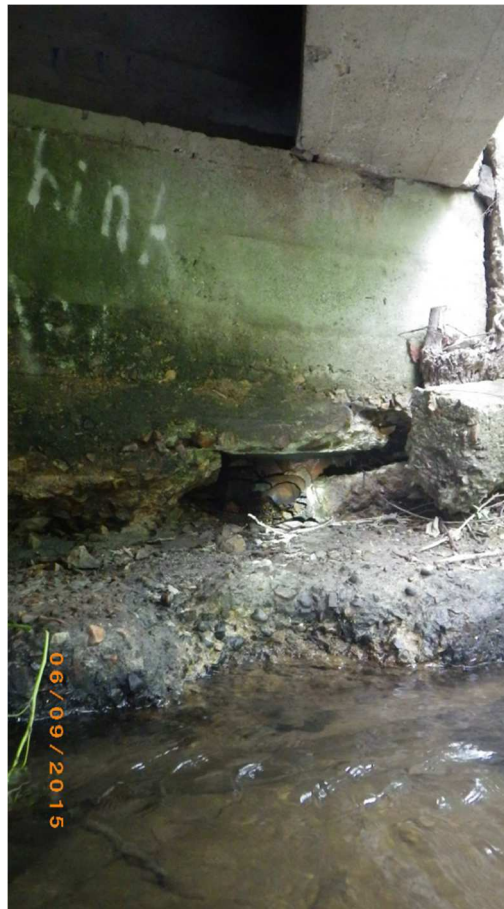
Damage to Abutment on East Side of Bridge
